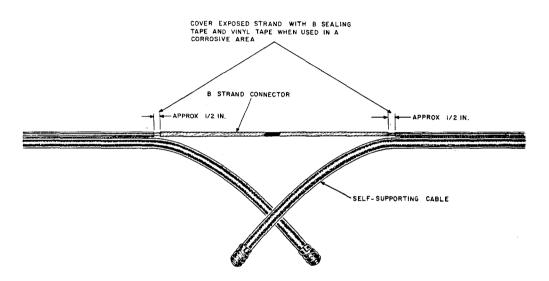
B Strand Connector Installed on Self-Supporting Cable
